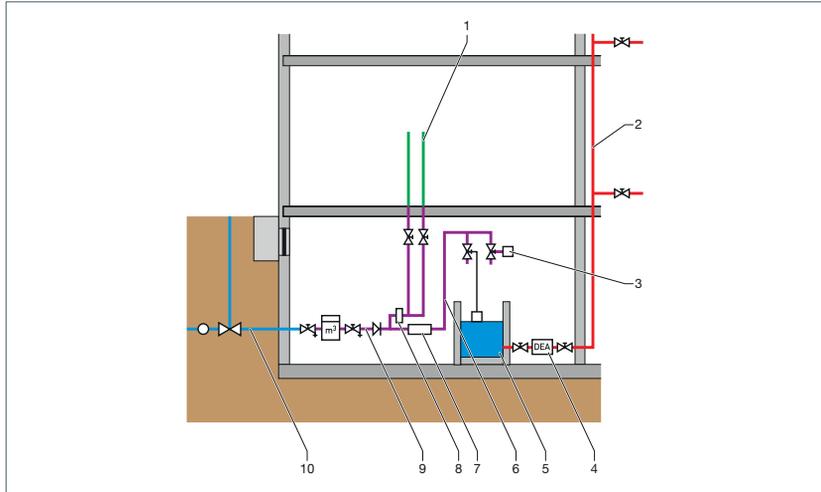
Firefighting water transfer point with direct connection to the potable water installation
